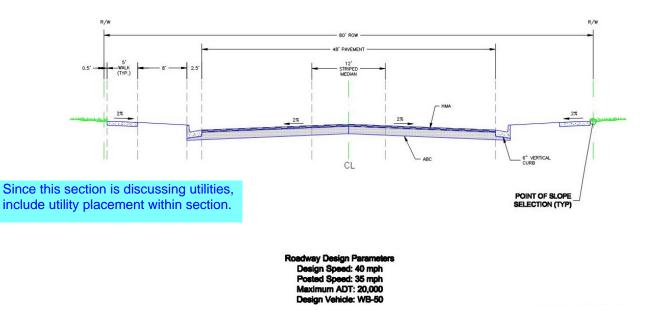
Urban Non-Residential Collector Roadway Standard Cross Section
